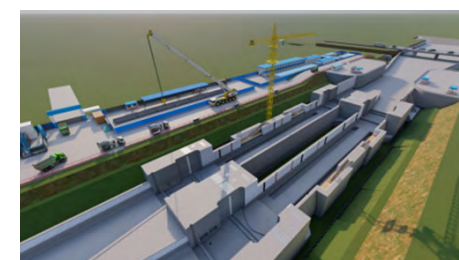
North Canal Gantang Lock Project- 3D Construction Site Layout
